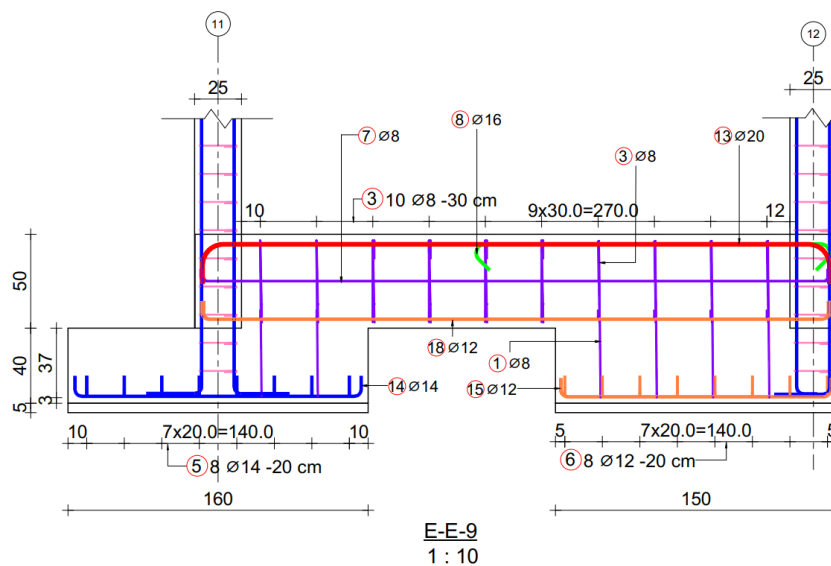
69. Longitudinal steel reinforcement plan of the strap footing
